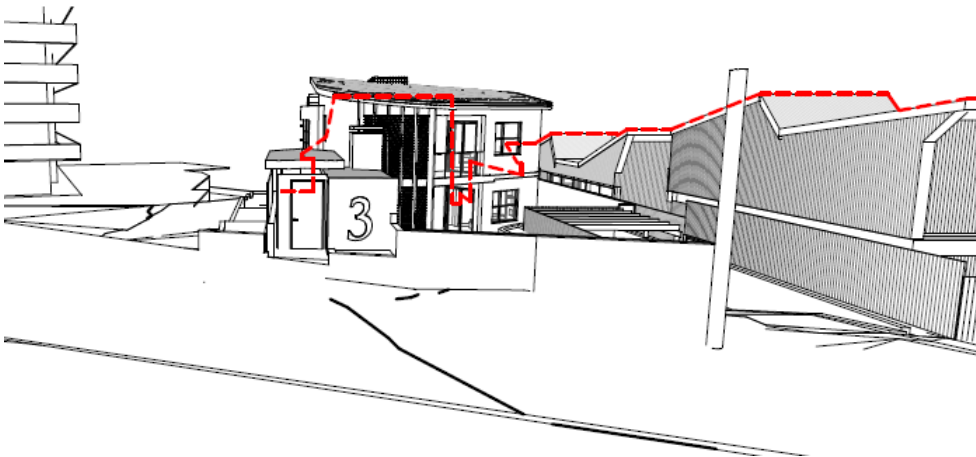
Plan Extract: Level 1 balcony view from 6 Lauderdale Avenue.
